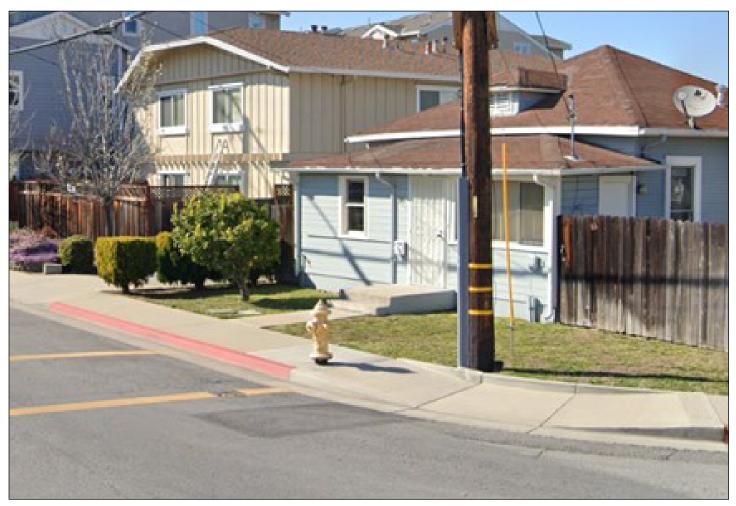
Misaligned curb ramp at Kennedy Avenue & Industrial Street
